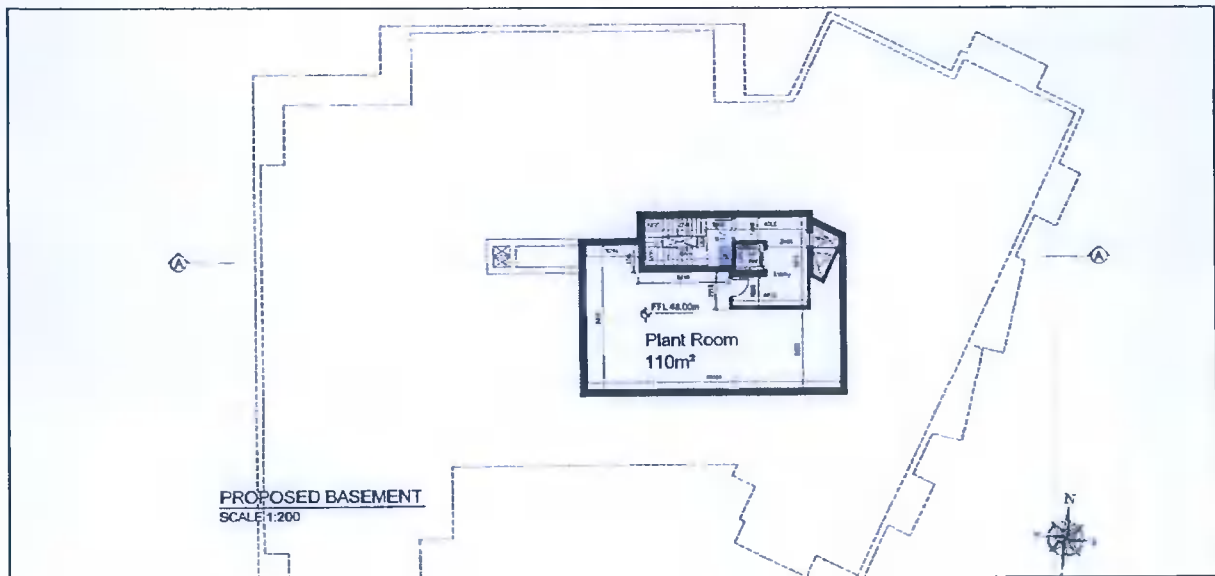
Proposed basement plan submitted under Reg. Ref. SD21A/0271.
